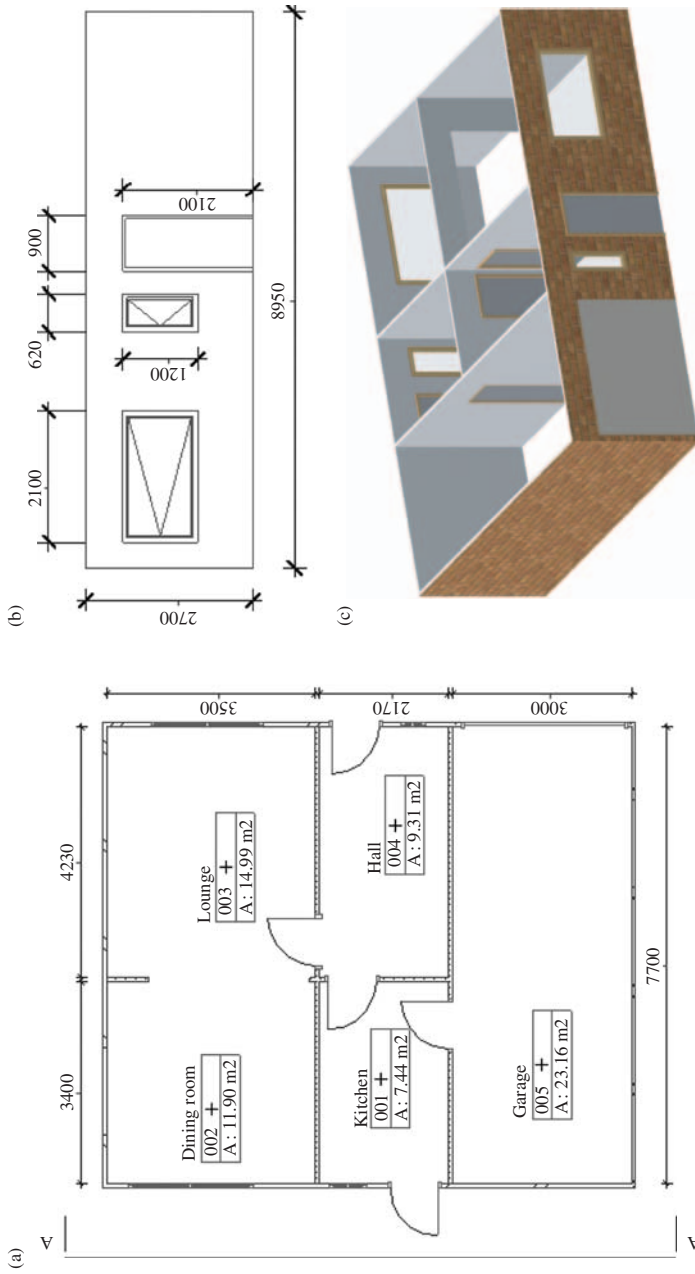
Ground floor of the two-story residential building: (a) plan elevation; (b) end elevation; section A-A; and (c) isometric view. (The color version of this figure is available online.)
